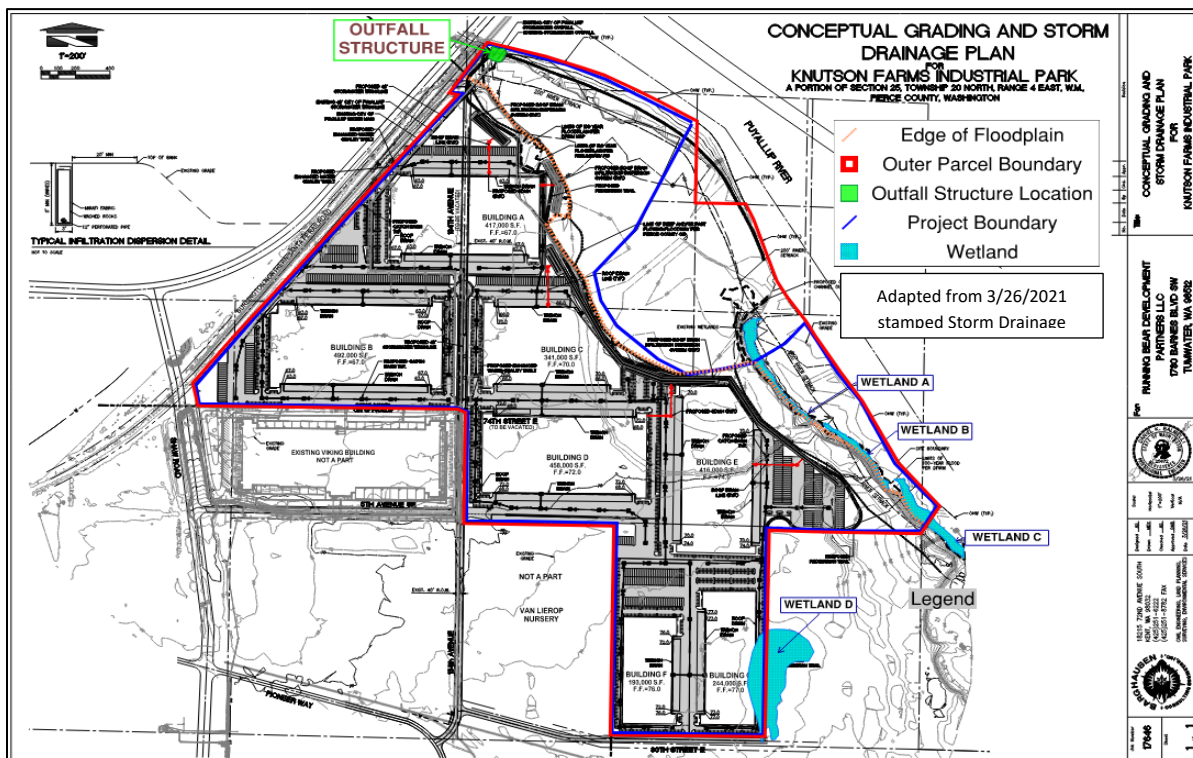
Showing Location of Stormwater Outfall Structure at Northern End of the Project Site
